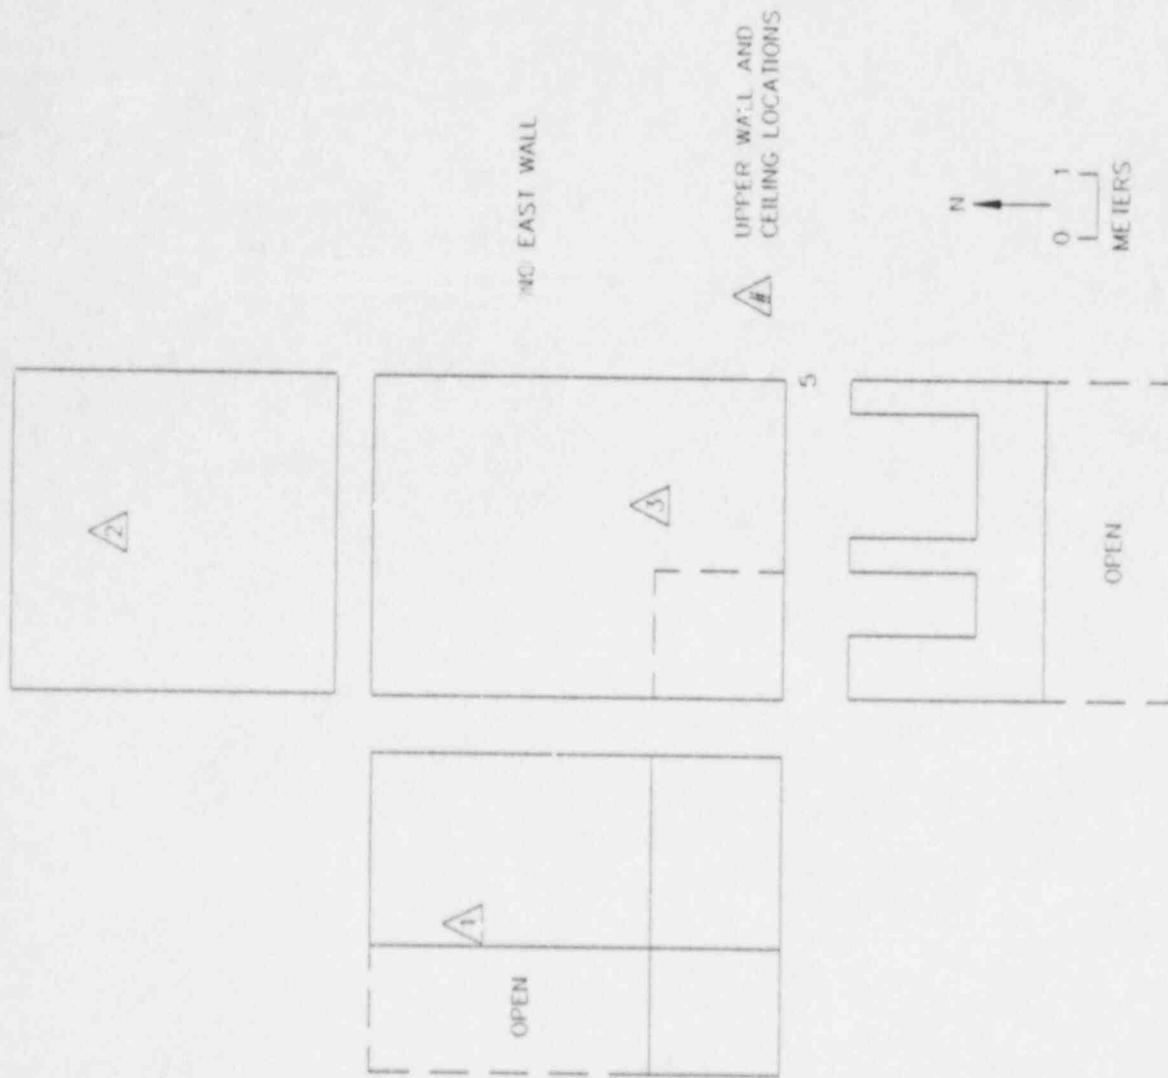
Room 26 Showing Locations of Upper Wall and Ceiling Single-point Measurements
